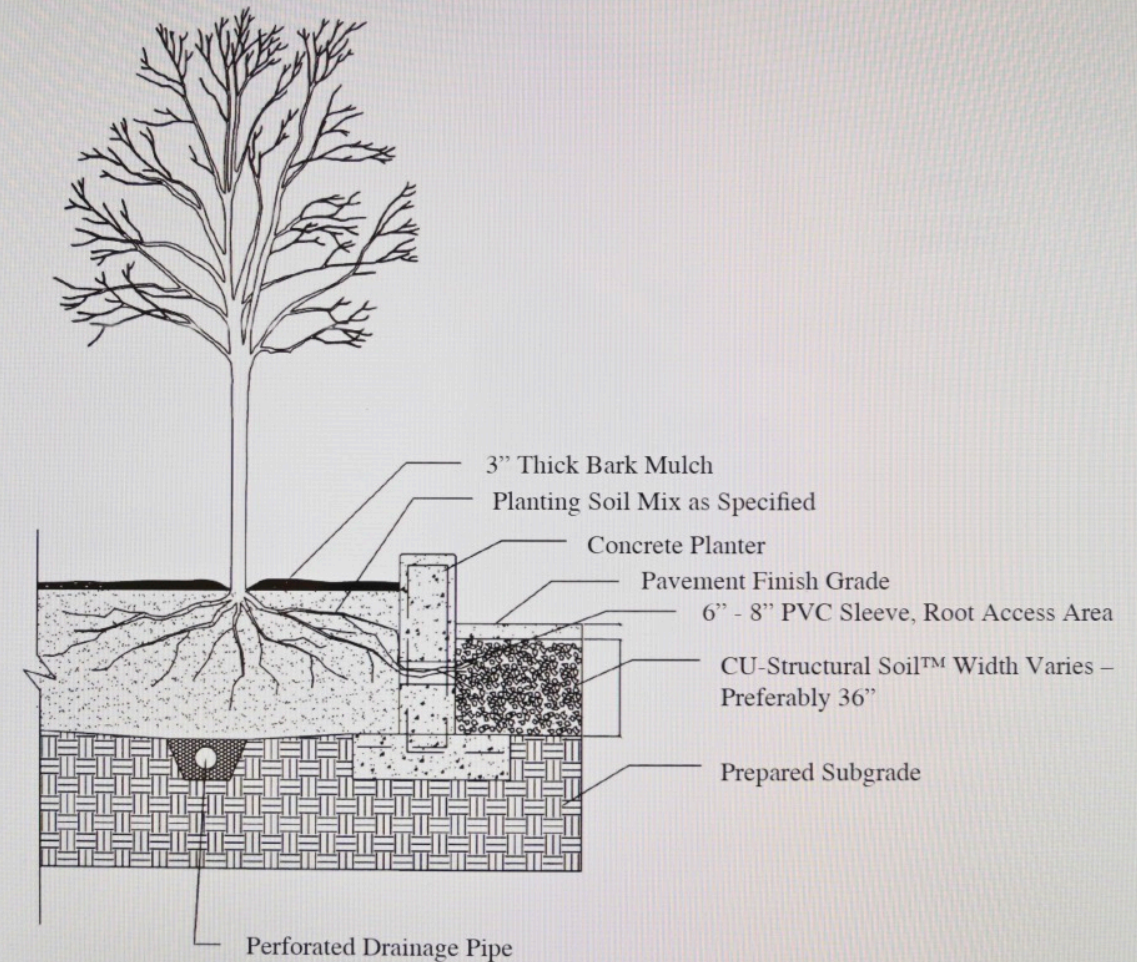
Limited soil volume planter with root access into CU-Structural Soil™ under plaza pavement
